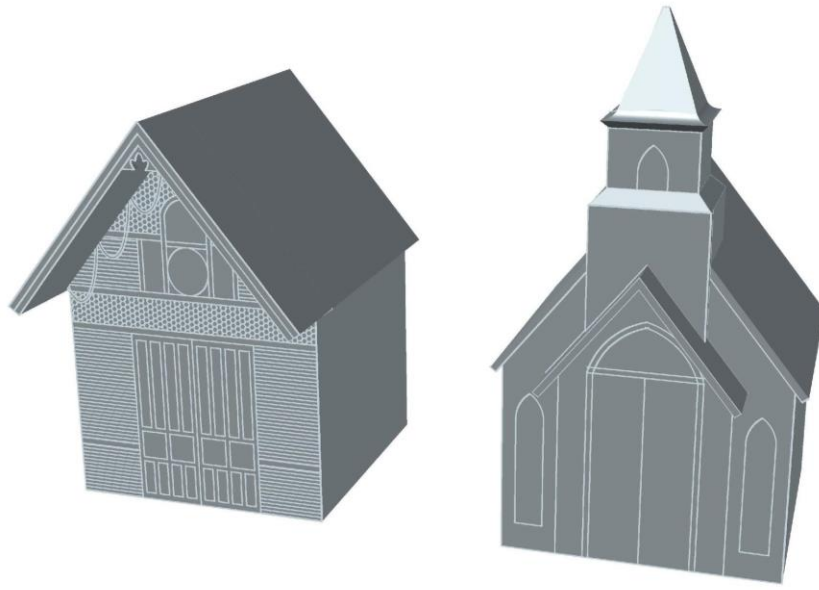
(left to right) 3D CAD Façade Drawings of Hose House and Sacred Heart Church
